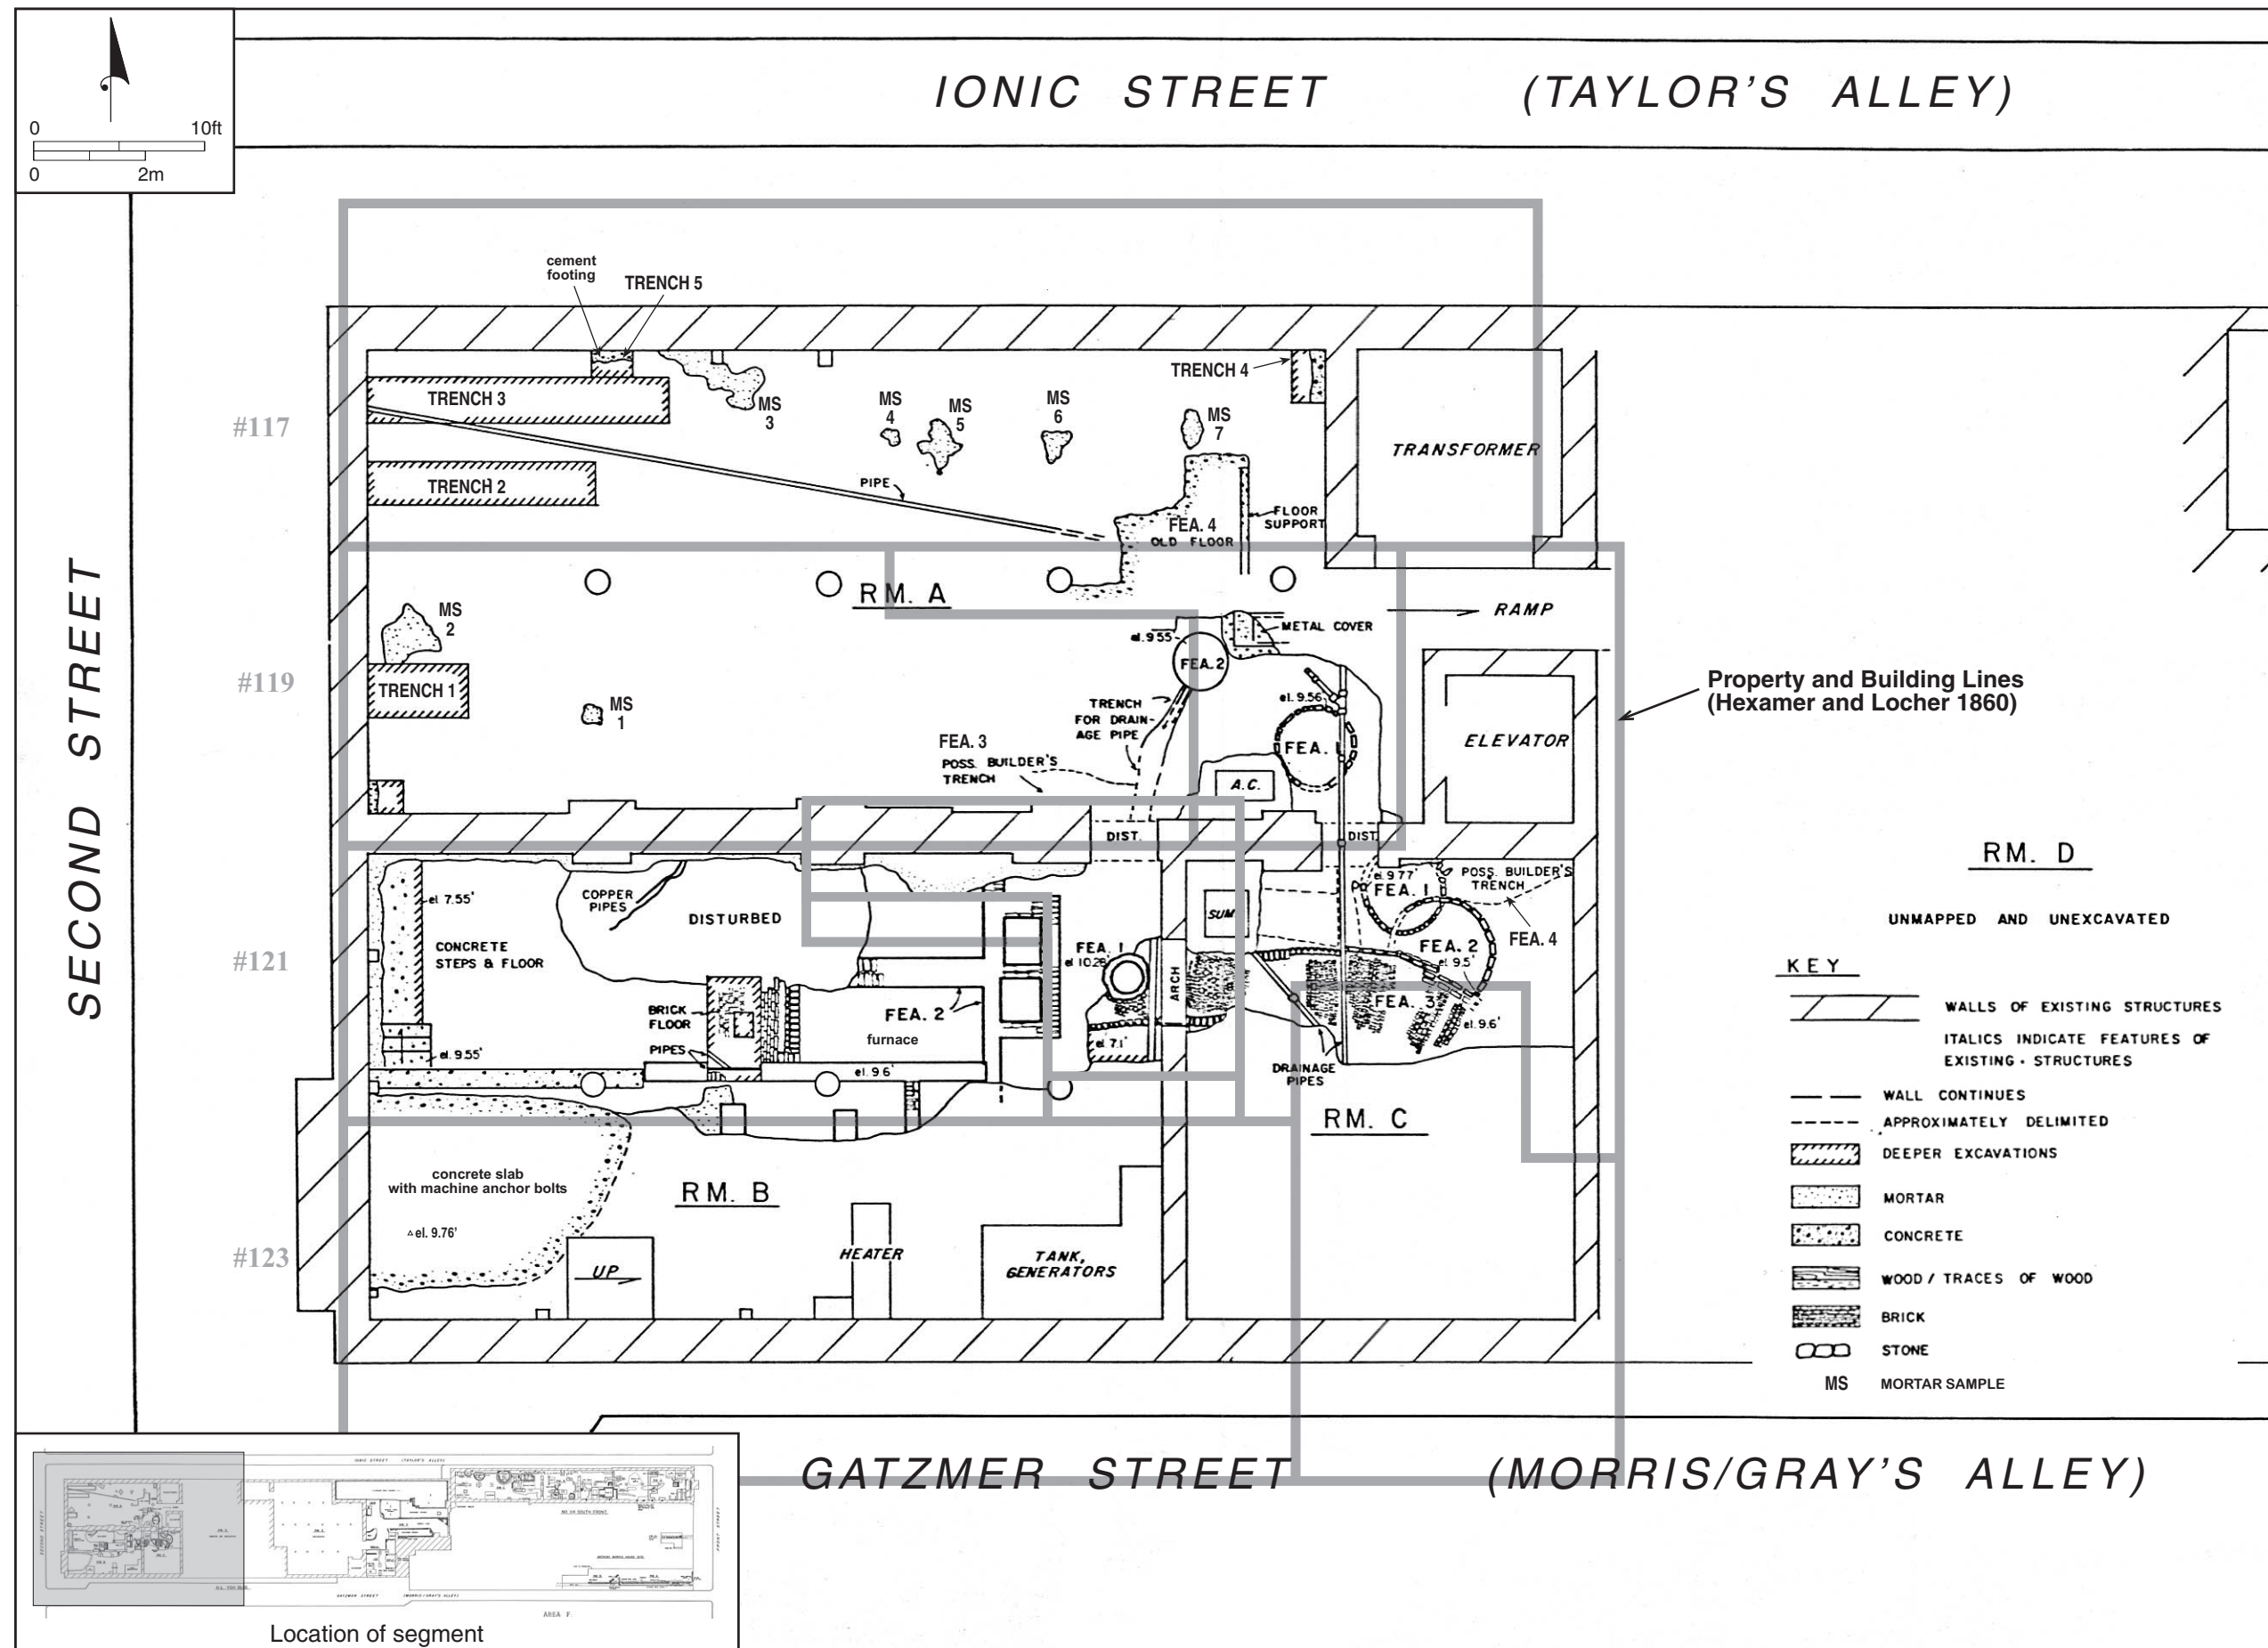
Plan of excavated trenches and exposed features in Rooms A, B and C of the Yoh Building, Area F site.
